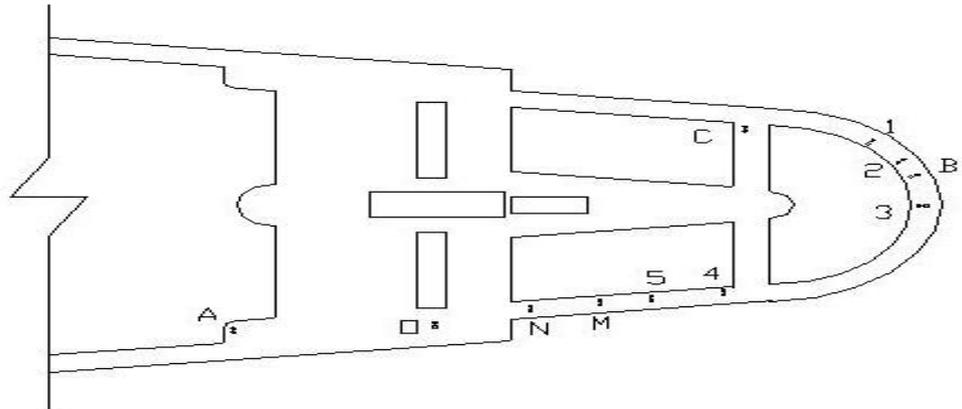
Plan showing schematic location of pins at the Paiva Castro dam spillway (not on scale).
